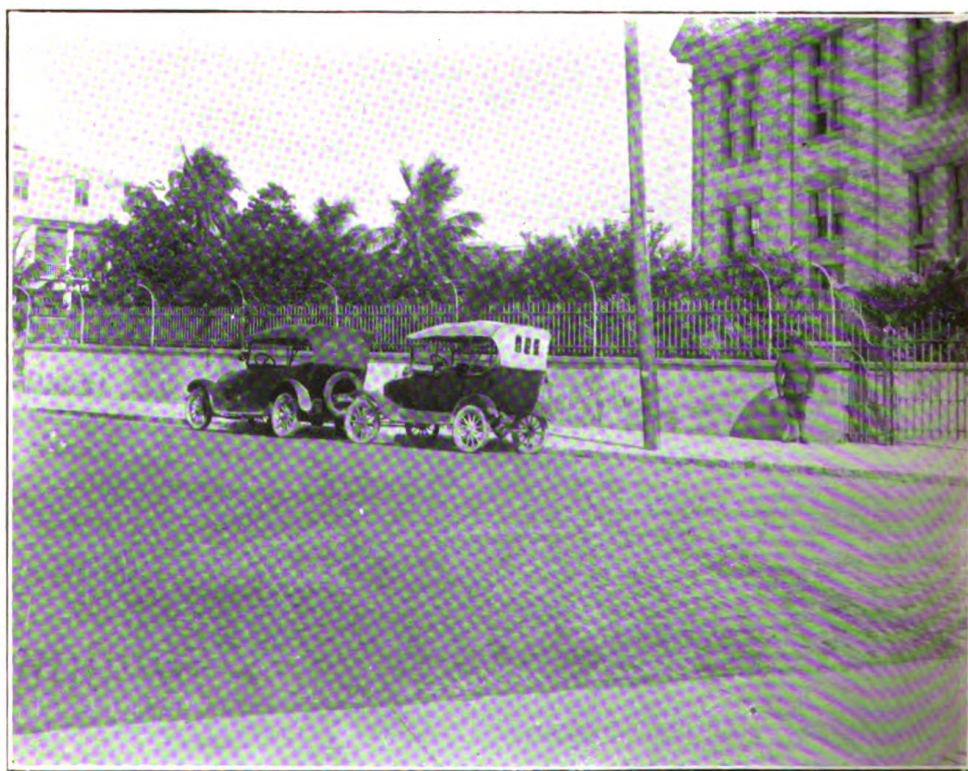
Concrete retaining wall, not less than 3 feet high at any point, and encircling the entire landward boundary of the station, excepting the breaks shown in Fig. 2.
